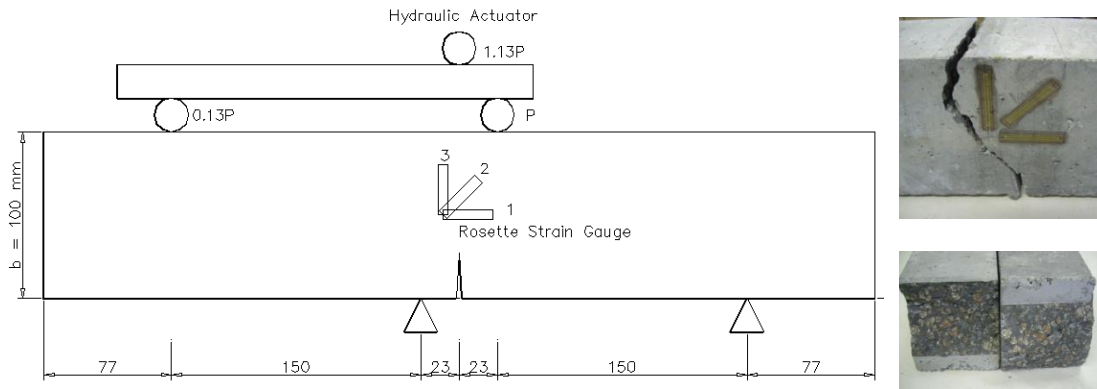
First Setup Geometry and Loading and Typical Crack Plane
